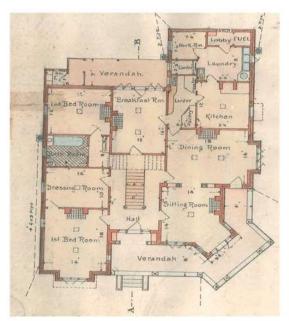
Ground floor plan of the proposed residence, 1909. Source: Prof. G. Murrell
